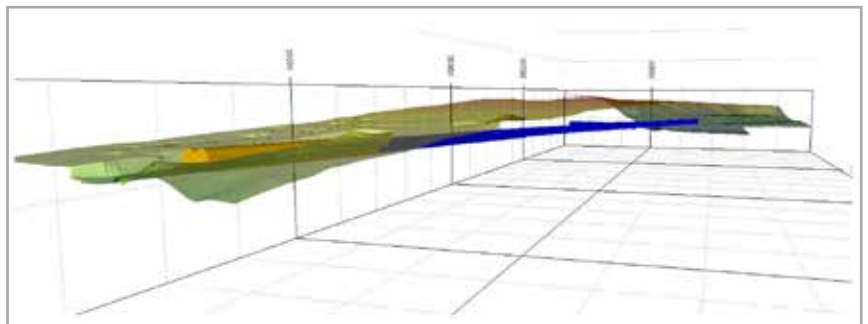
Frame model of the actual surface and of the tunnel’s underground structure.
